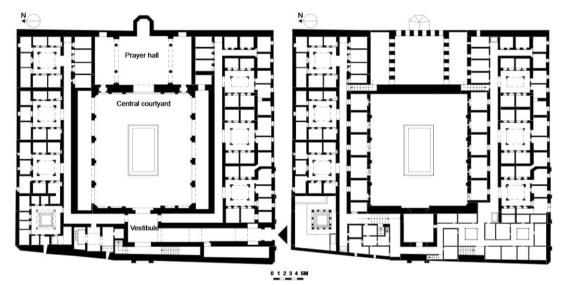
Plan of Ground Floor and First Floor of *Ben Youssef Madrasa* (Triki and Divifat, 1999, p.162-164)
